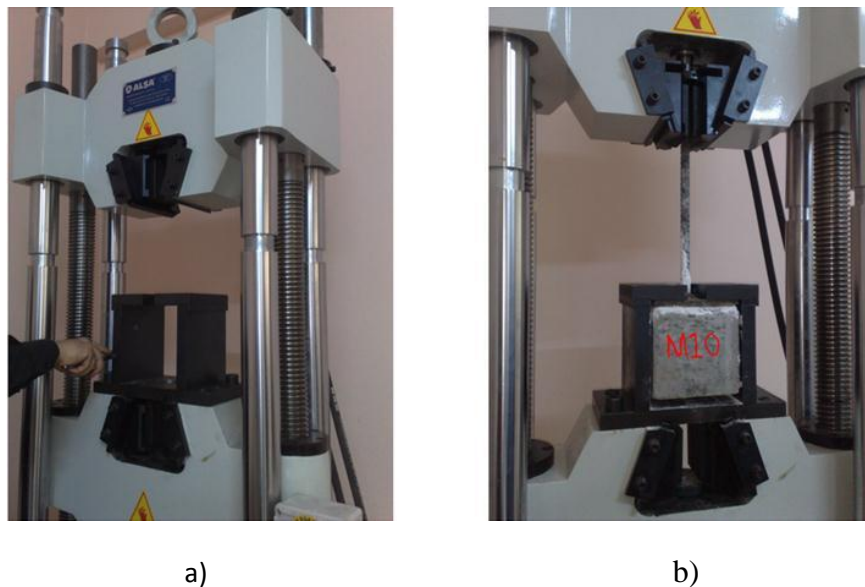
Photographic view of the pullout test device a) installing the test apparatus b) testing the specimen
